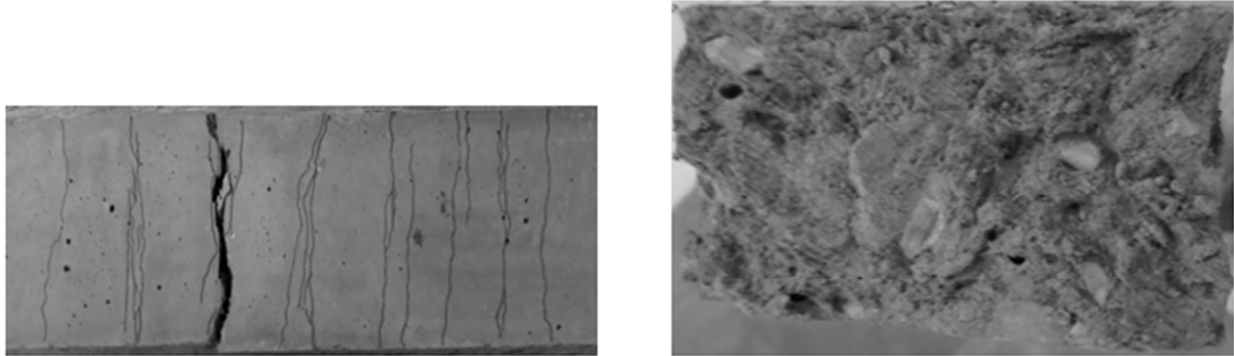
Cracking pattern of beam 5 for 36-inch beams
